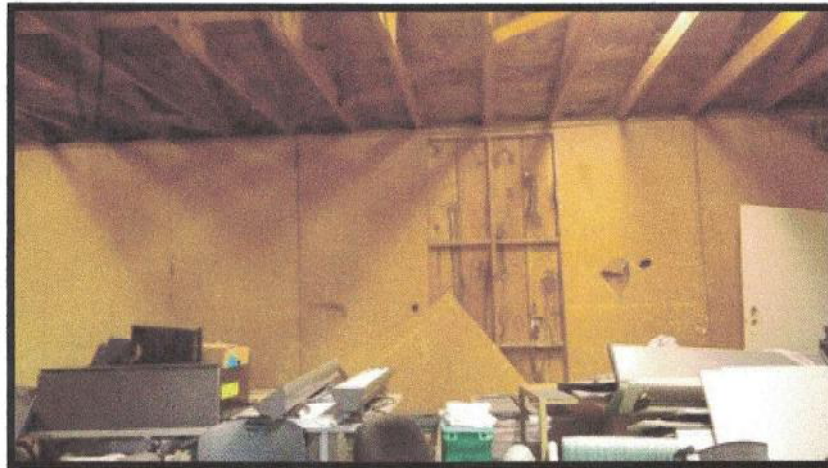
The interior of the garage is finished with unpainted drywall and a concrete slab. The garage is currently used for storage by FMC. Viewing east.
